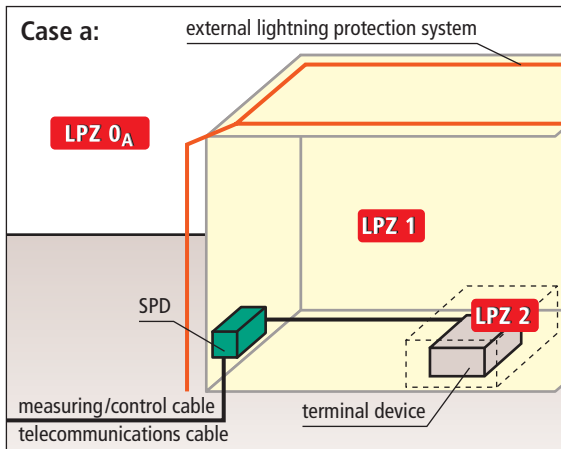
Building with external lightning protection system and cables installed between buildings
